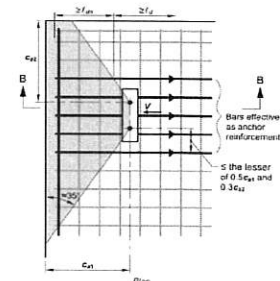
(b)—Edge reinforcement and anchor reinforcement for shear.
